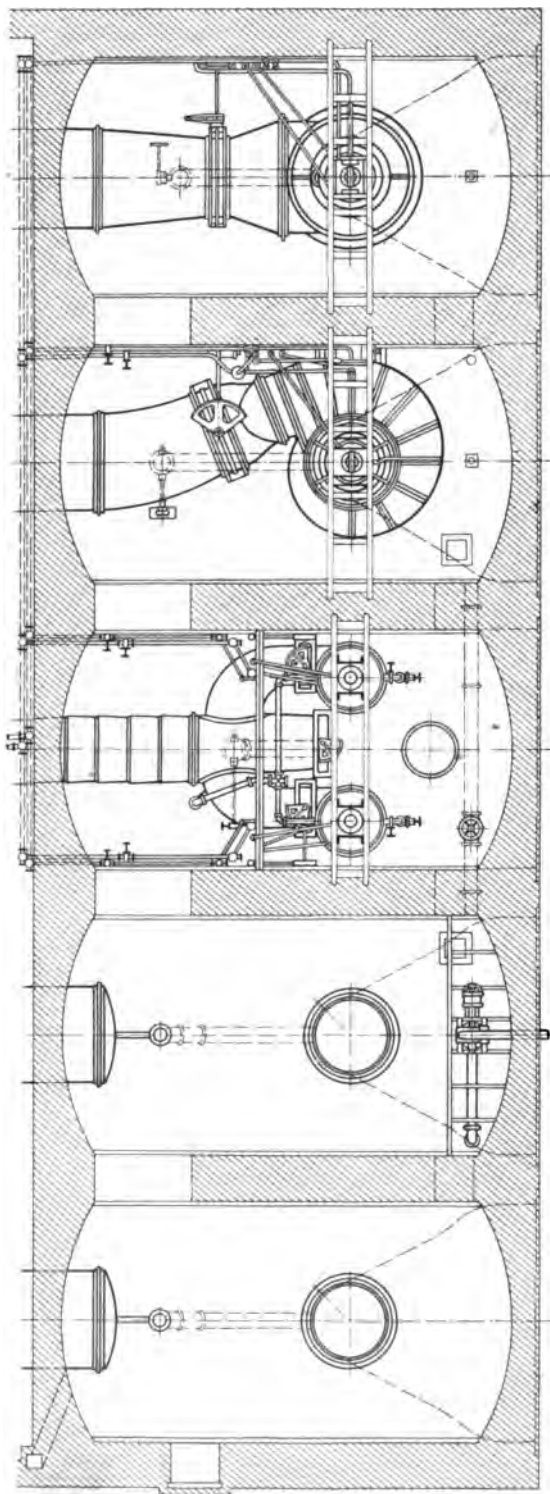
Plan of Turbine Chambers, Kijikkelsrud Power Plant, Norway.
